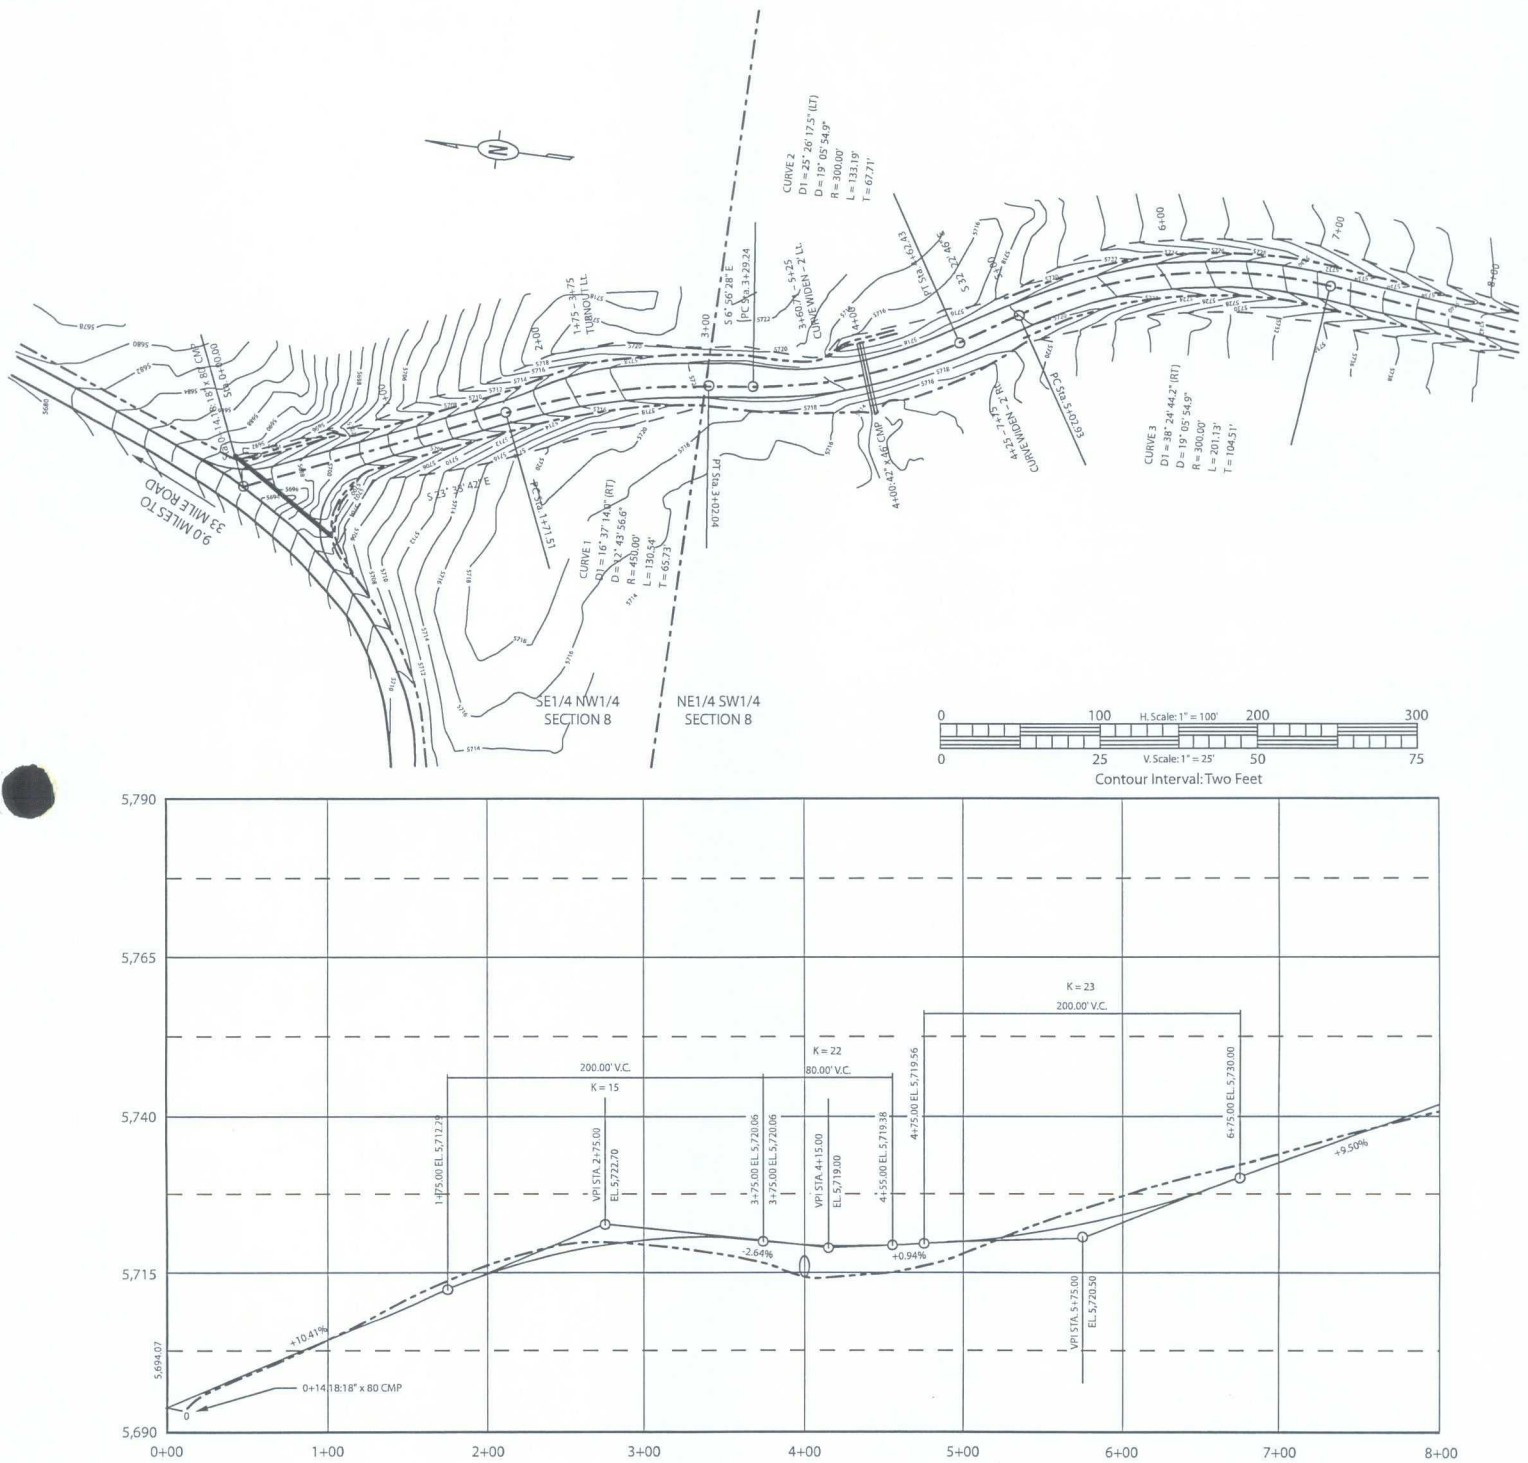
Typical road plan and profile drawing for an oil and gas road.
